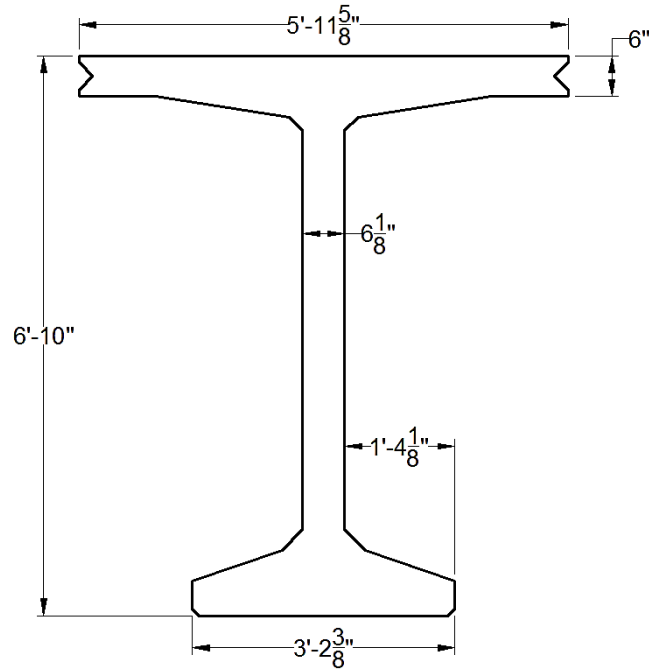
Typical section of a decked bulb-tee girder (Source: PCI 2011)
